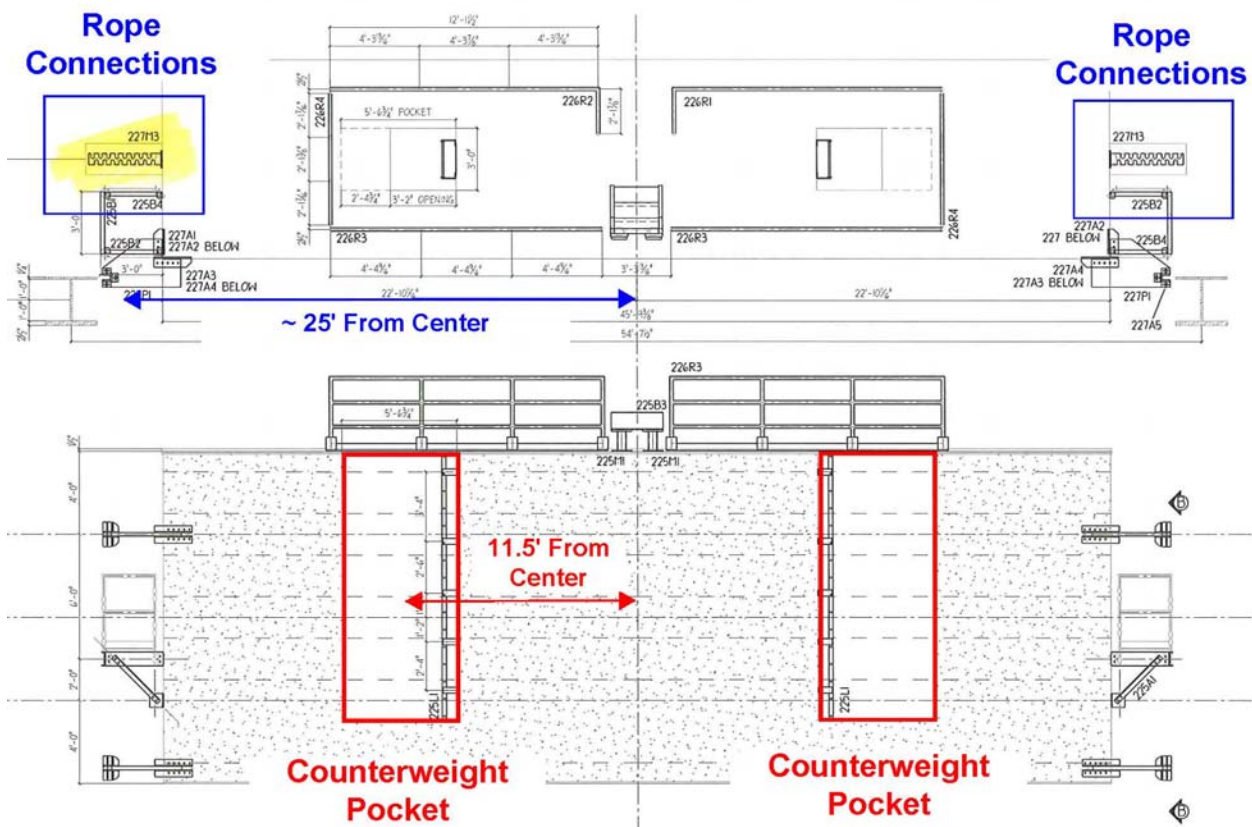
Plan (Top) and Elevation View of Counterweight Pocket and Rope Locations, Example 2.
